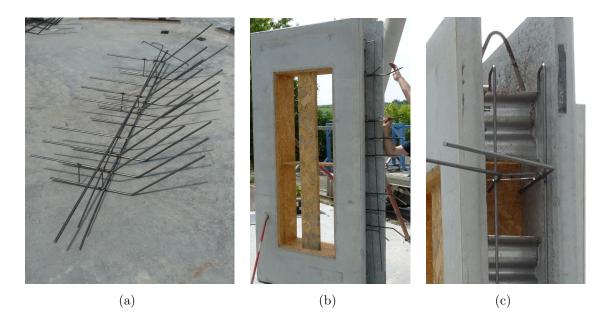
Horizontal reinforcement cage (a) before it is placed, (b) placed in the lateral hollow double wall space and (c) fixed by hooks at the top Kappema wave
